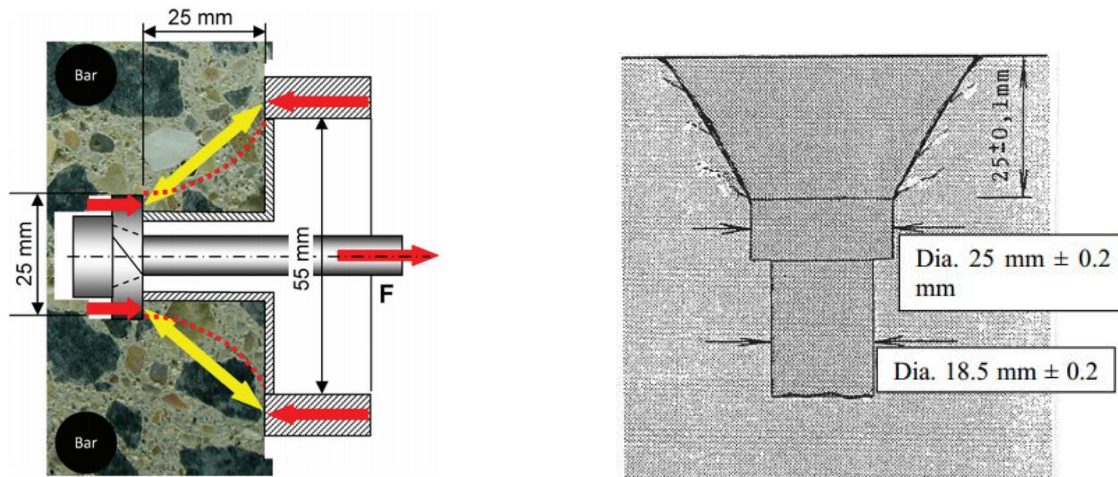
(a) Cross-sectional view of CAPO-TEST (b) Cross-section of Capo-Test failure with minor circumferential cracking (after Germann Instruments, Manual 2018)
